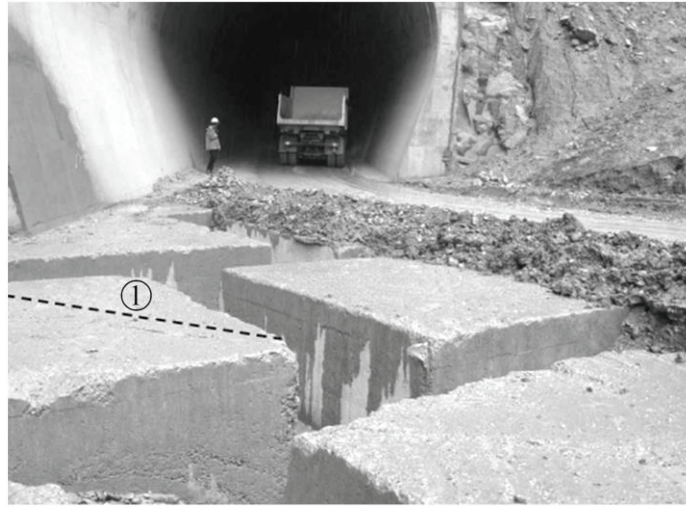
Diagonally divided concrete cubes placed as erosion protection at Diversion Tunnel 1 of Seymareh Dam in Iran with ① lost formwork (Emami et al. 2006a) (Courtesy: S. Emami)
